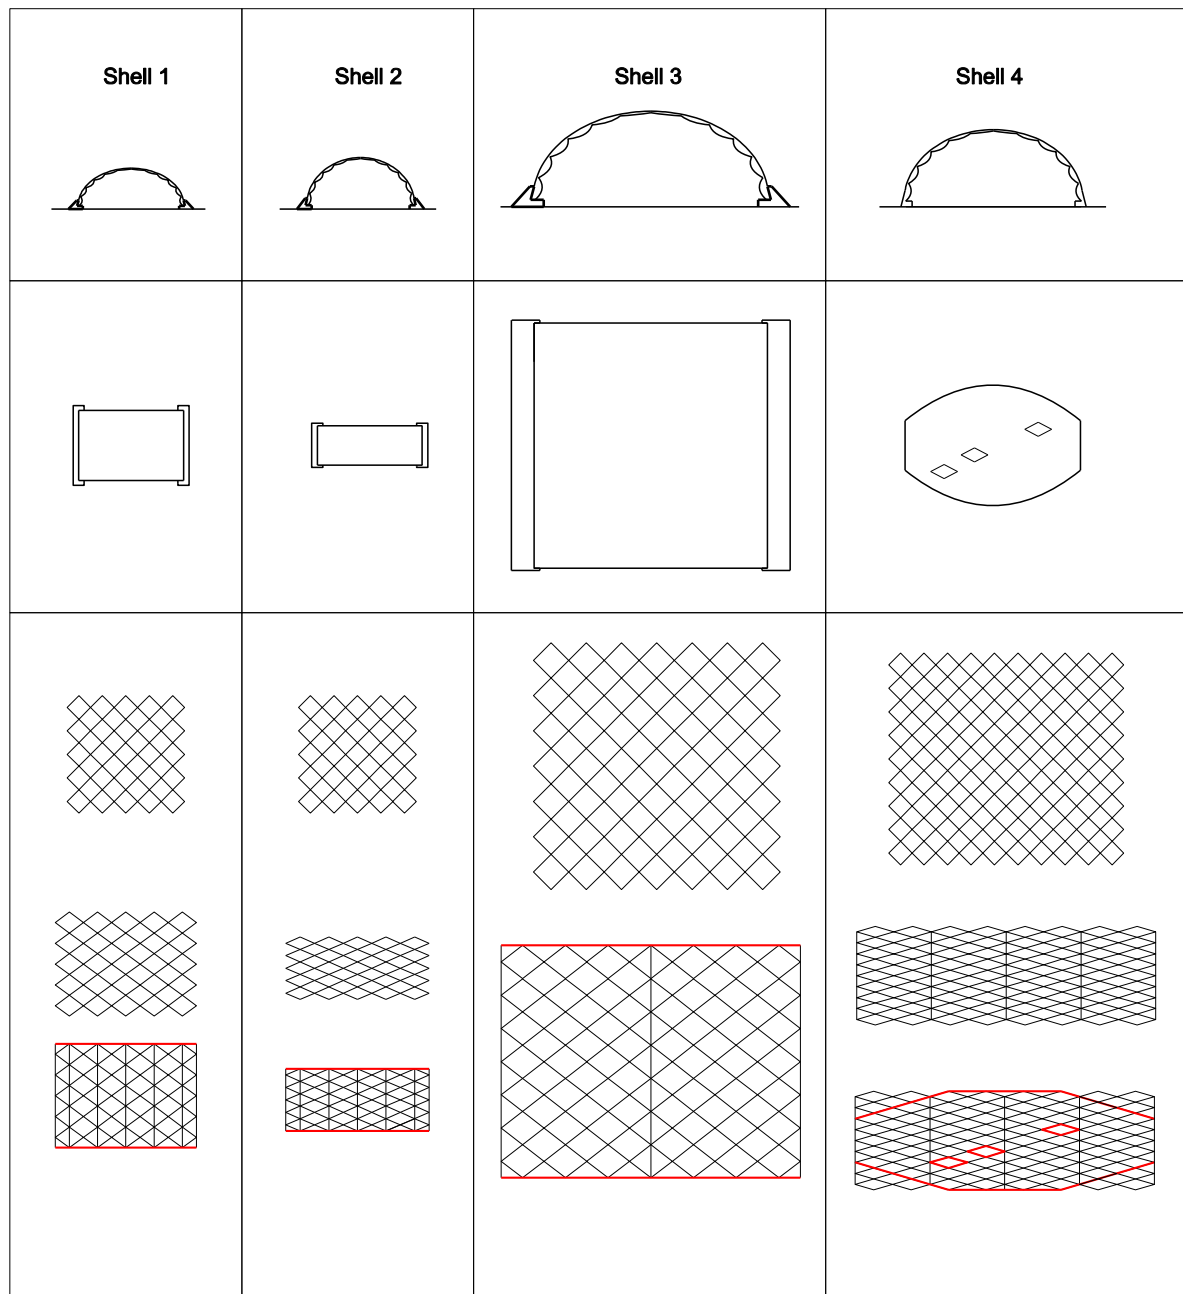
Chart of Experimental builds using deployable and actively-bent gridshells as formwork to cast concrete shells.
